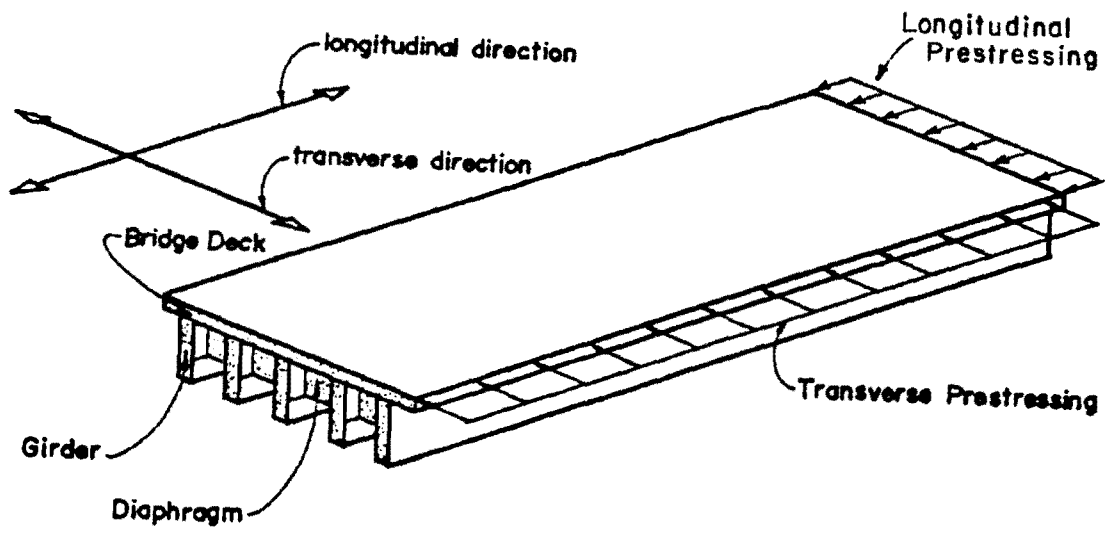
Deck prestressing of a conventional slab-girder bridge
